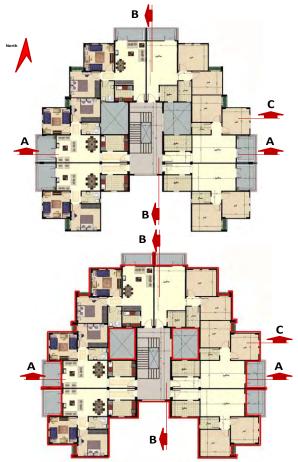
Case study floor plan before (above) and after adding insulation around external walls (below)
